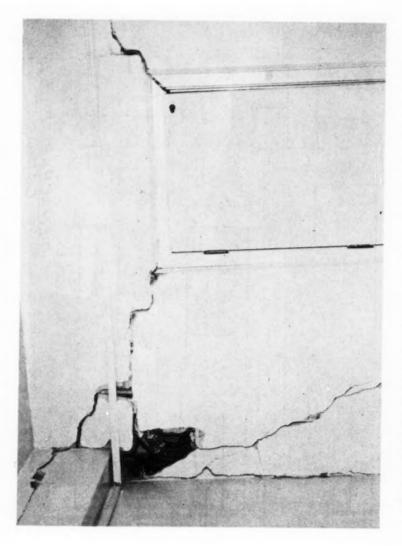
Tehachapi State Prison. Interior tile partitions in top floors were badly cracked.
